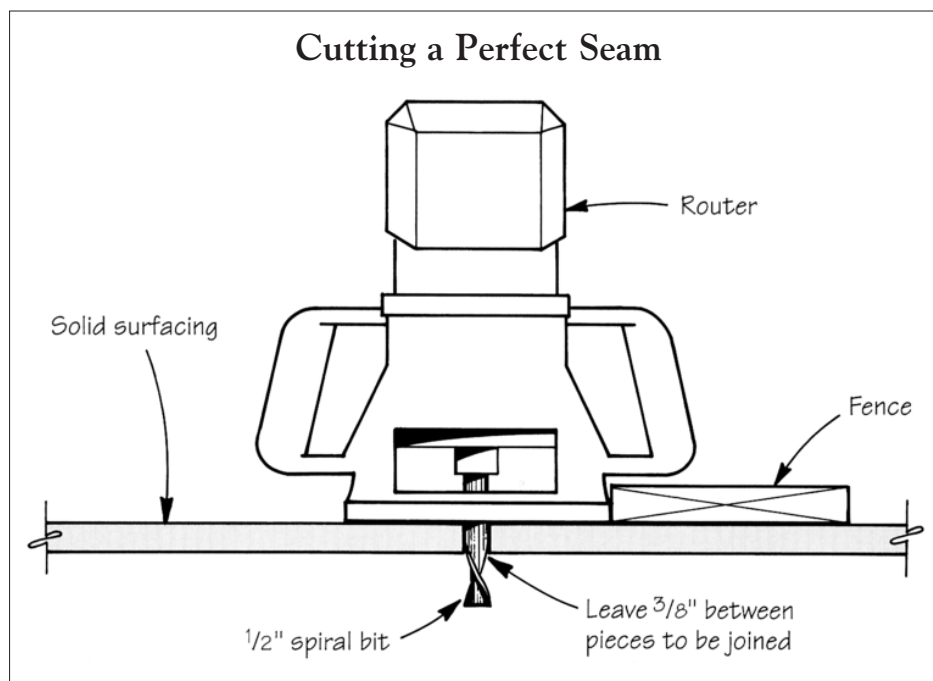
To cut matching edges for a seam, the author first clamps the two pieces of solid surfacing $\frac{3}{8}$ inch apart. Using a straightedge as a guide, he then runs a router with a $\frac{1}{2}$ -inch spiral bit down the center.
